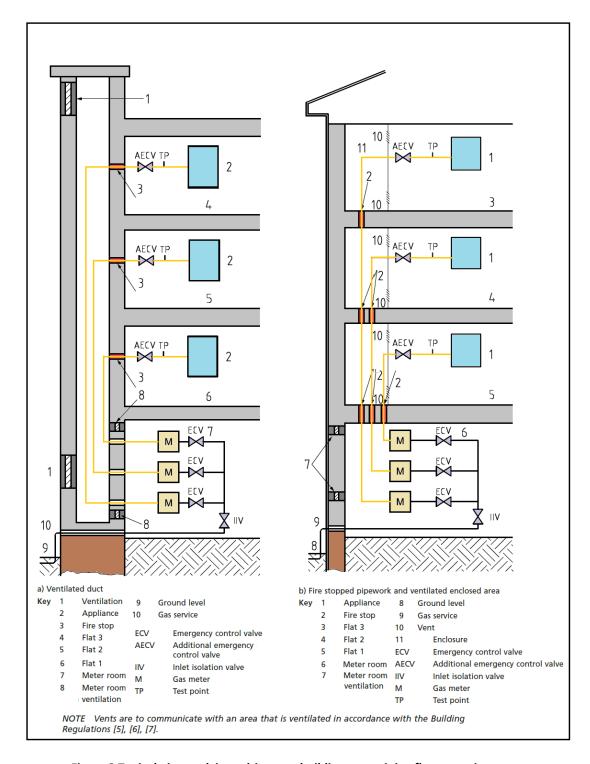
Typical pipework in multi-storey buildings containing flats or maisonettes
